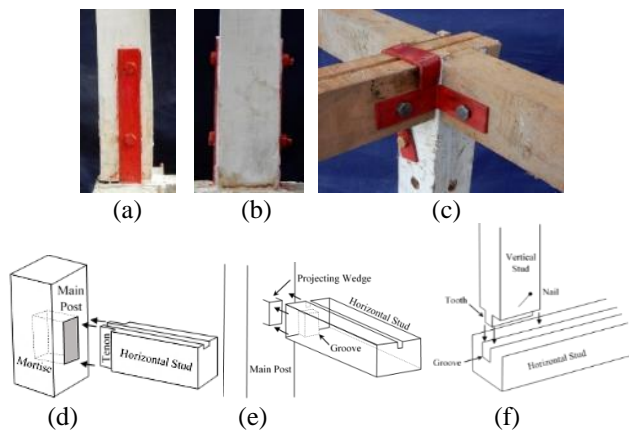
Connections in Assam-type house specimen: (a) Joint A, (b) Joint B, (c) Joint C, (d) Joint D, (e) Joint E, and (f) Joint F.
